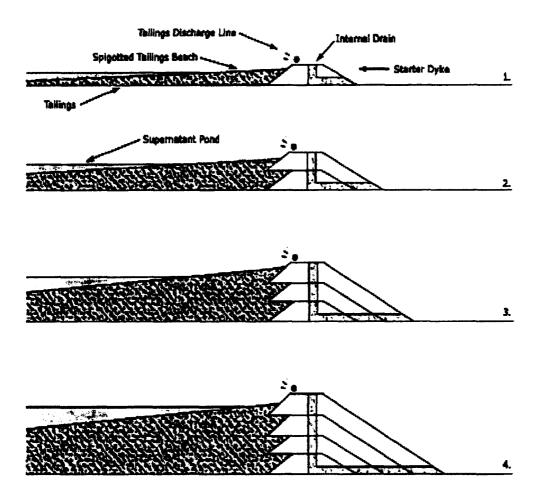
Stages of centerline method of raised embankment construction (Vick 1990)
